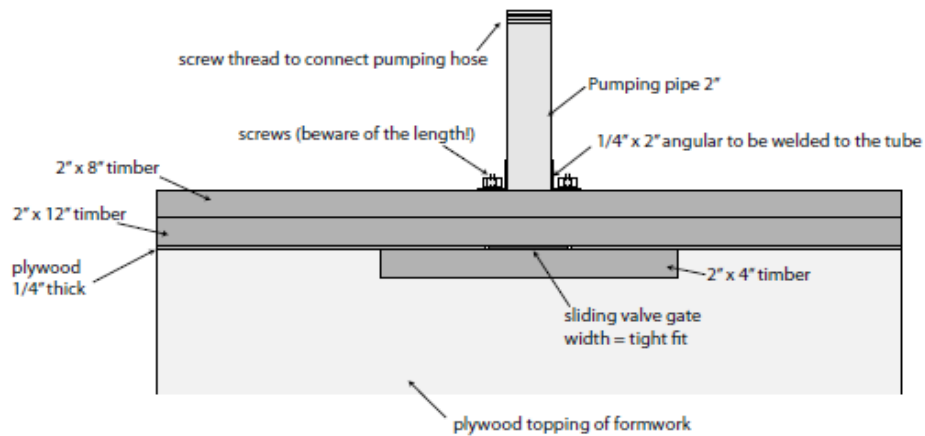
Schematic of the pumping line connected to the one end of the formwork
